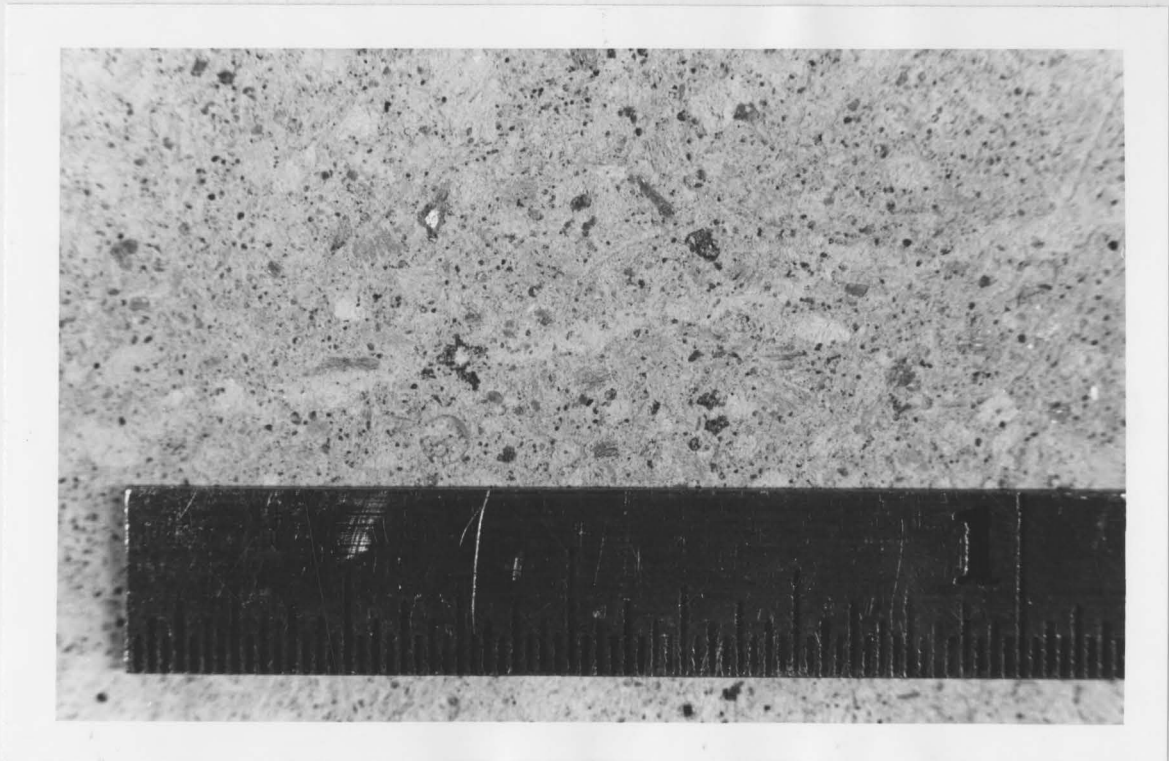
CROSS SECTION OF VERMICULITE CONCRETE
